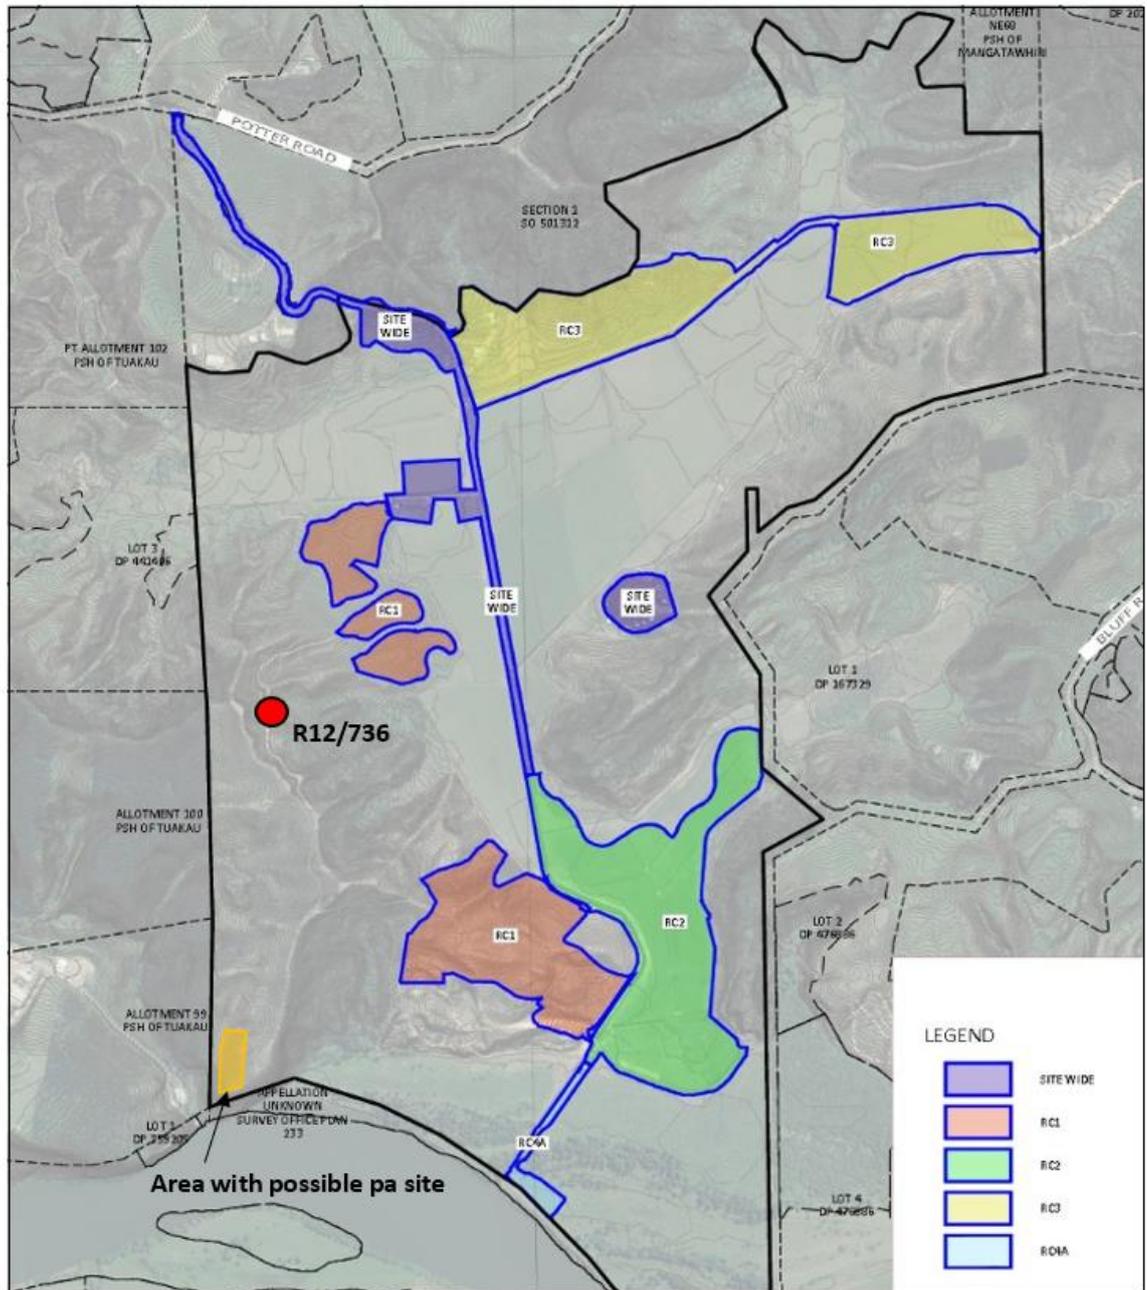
Aerial plan showing the locations of RC2, RC3 and RC4-A and Site Wide works areas in relation to the recorded archaeological site (R12/736) and area with possible pa site (source: Civil Plan Consultants)
